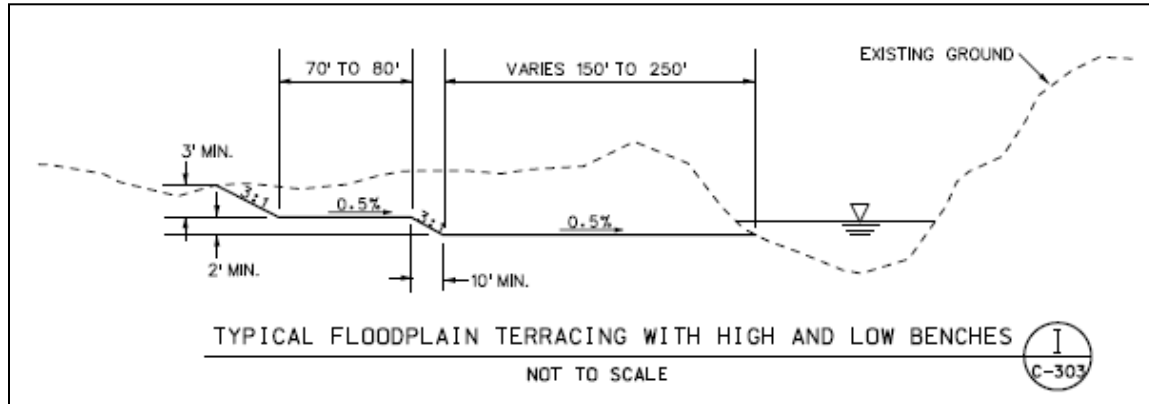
Typical Cross Section of Proposed Floodplain Terraces.
